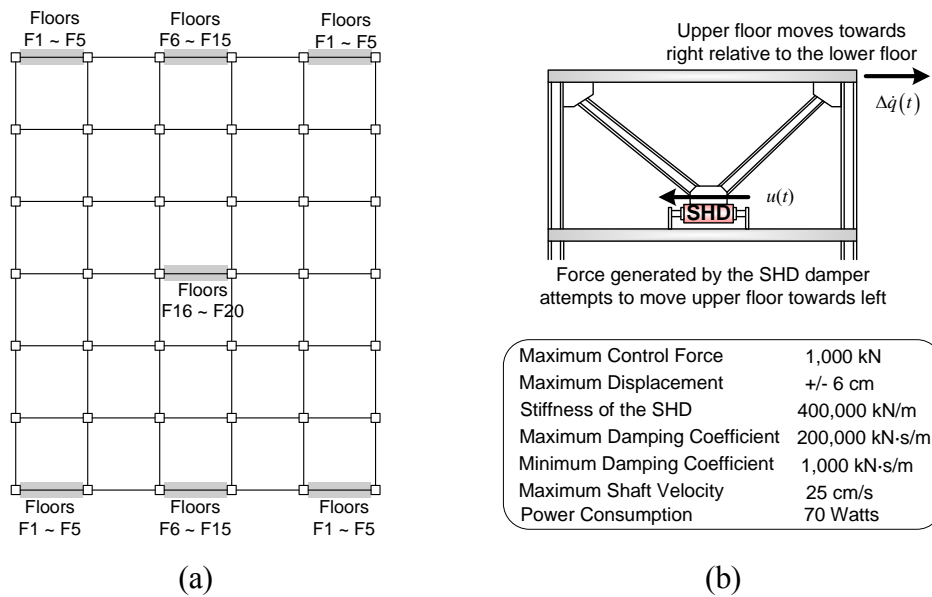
Instrumentation of semi-active hydraulic dampers (SHD) in the 20-story structure: (a) layout of dampers on the floor plans; (b) key parameters of the dampers.
